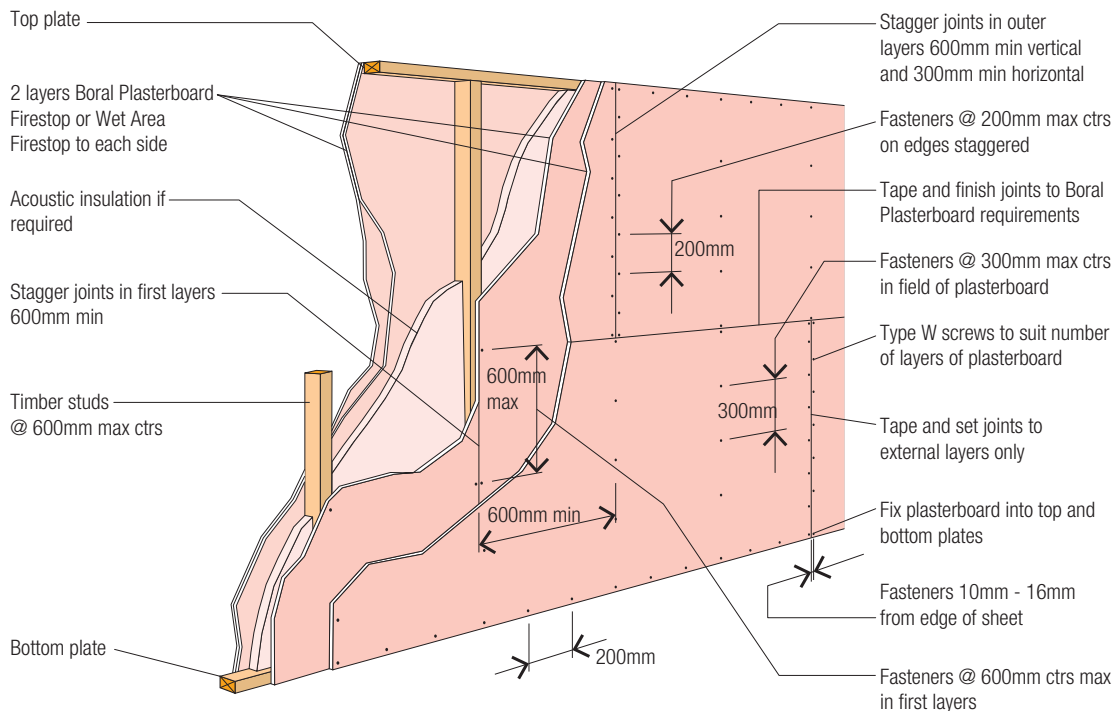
Fire Rated Timber Framed Wall - Mixed Orientation (Multiple Layers)
